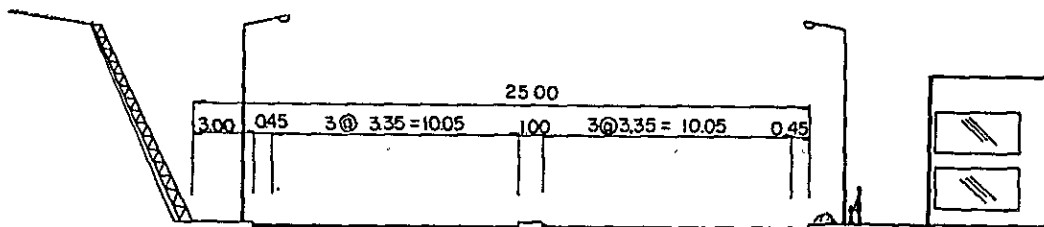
WIDENED CROSS SECTION OF VIA ESPANA(2)
